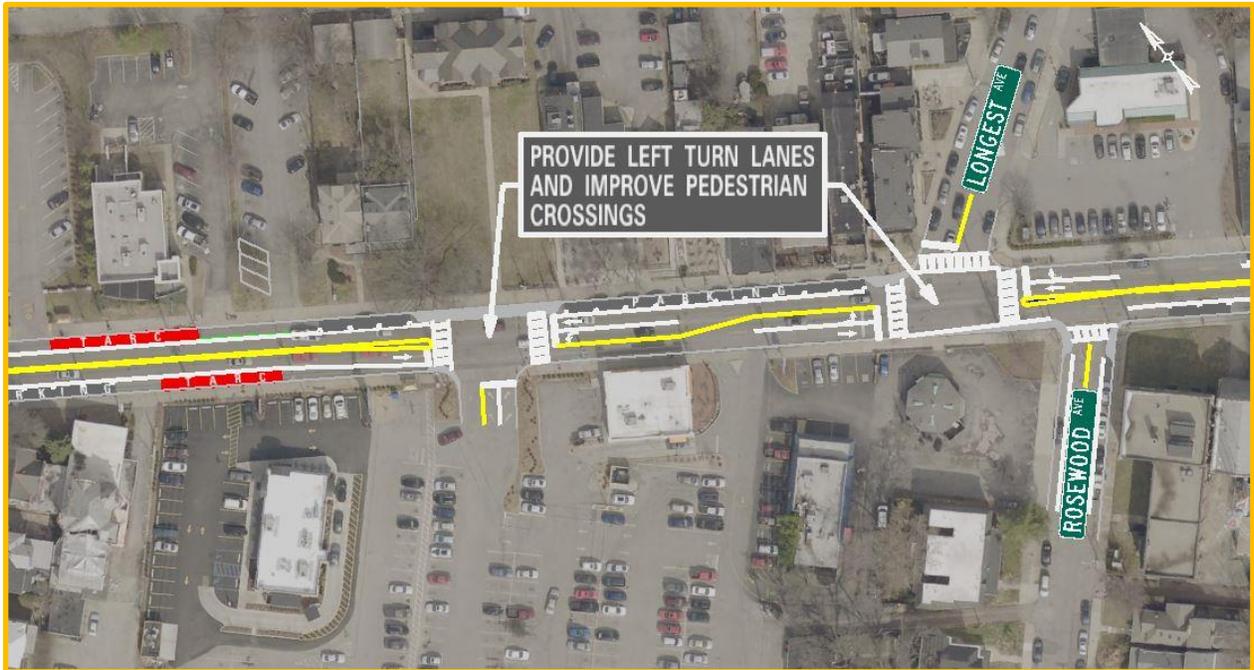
Bardstown Road at Mid-City Mall and Longest Avenue—Proposed Configuration
